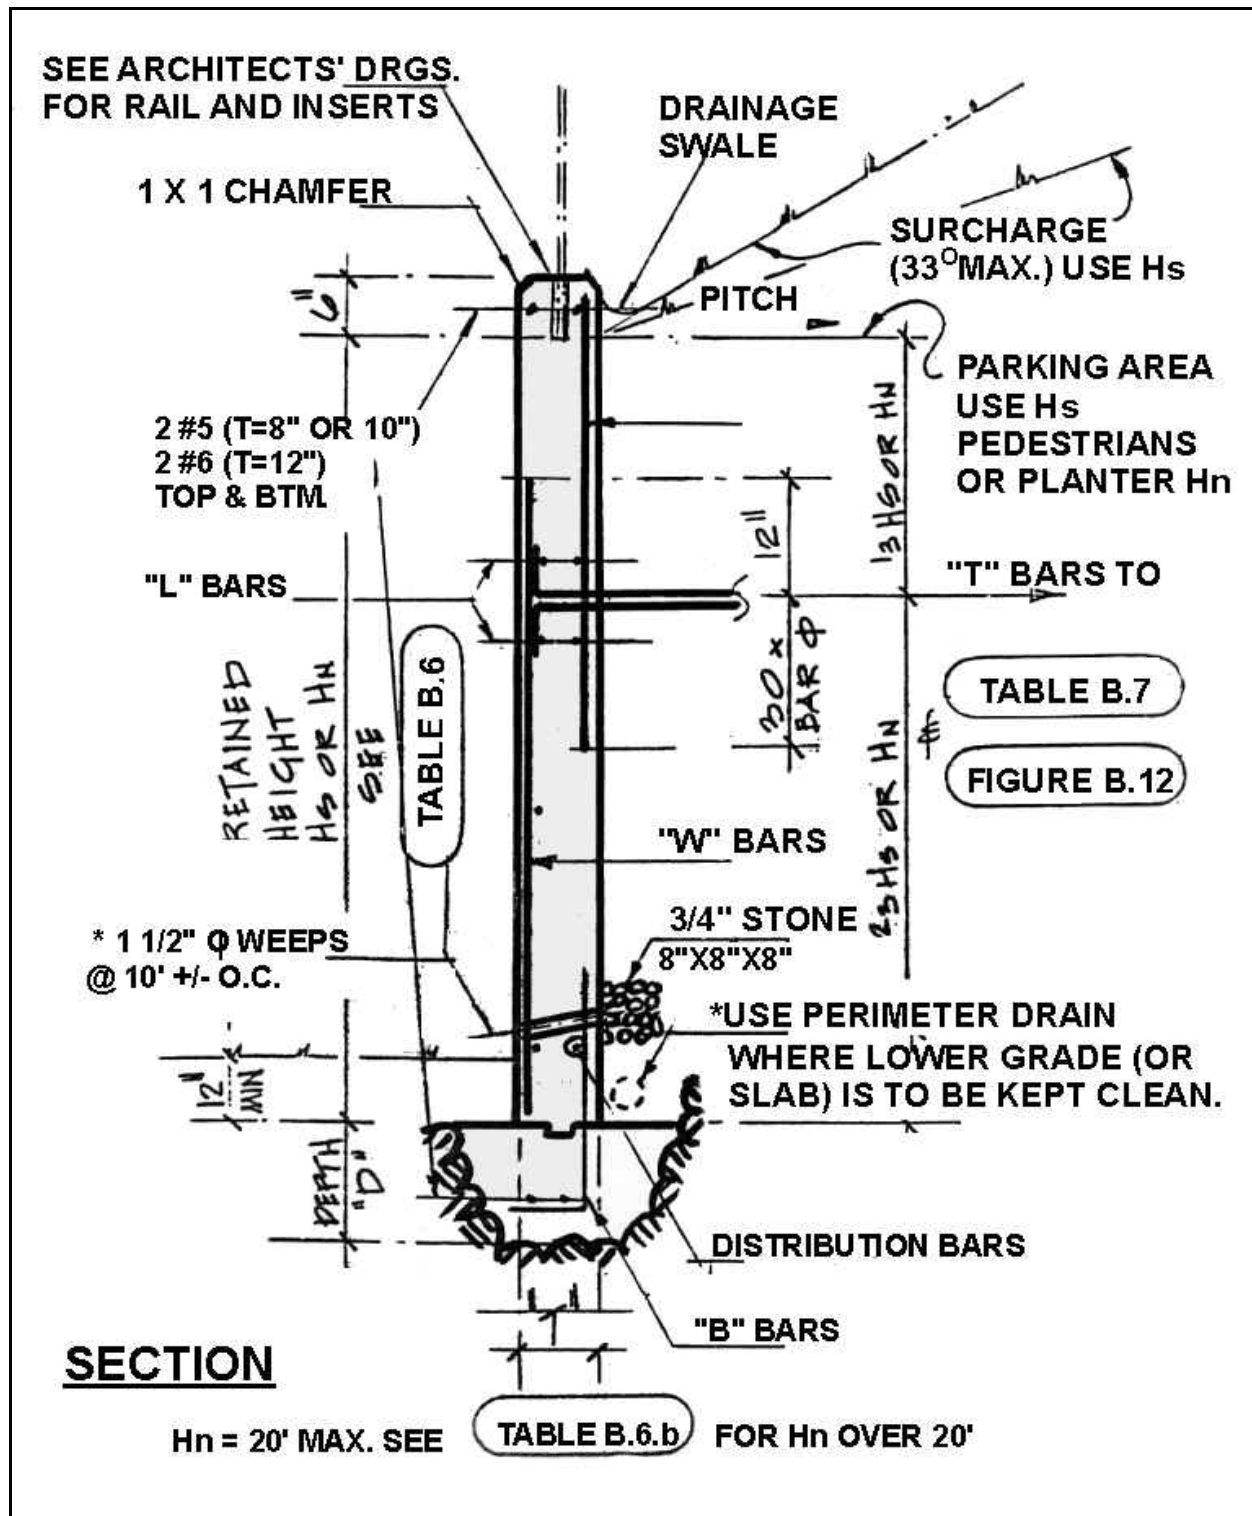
Concrete retaining wall with tie-back to anchor. H = 0 to 16 feet (Bernier, 1995).
